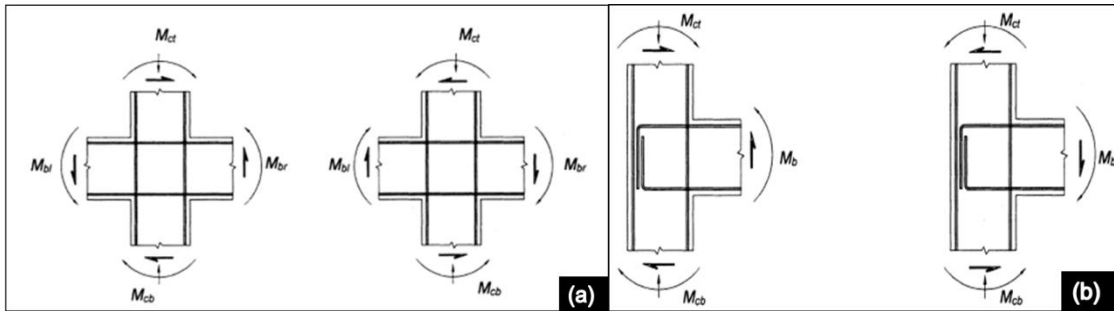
Schematic Representation of Strong Column Weak Beam Concept Introduced in, a) Interior Beam Column Joint, b) Exterior Beam Column Joint
